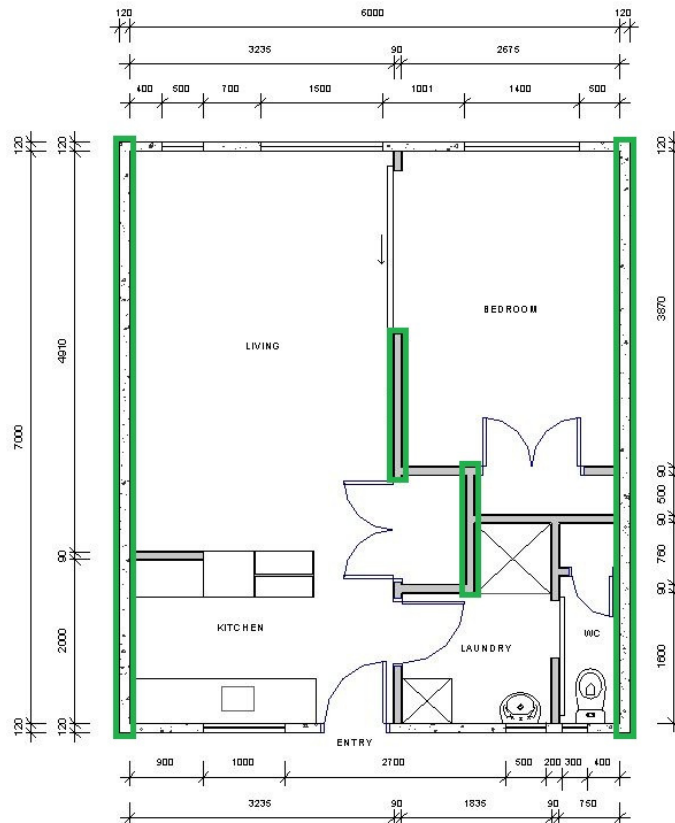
Walls used for bracing in the transverse direction, single bedroom unit.
